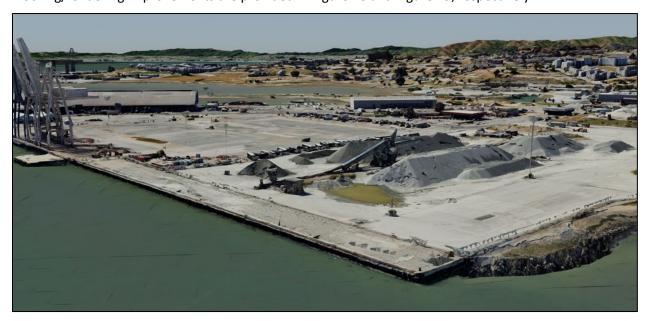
Pier 94 Mooring and Fendering – Current Condition
